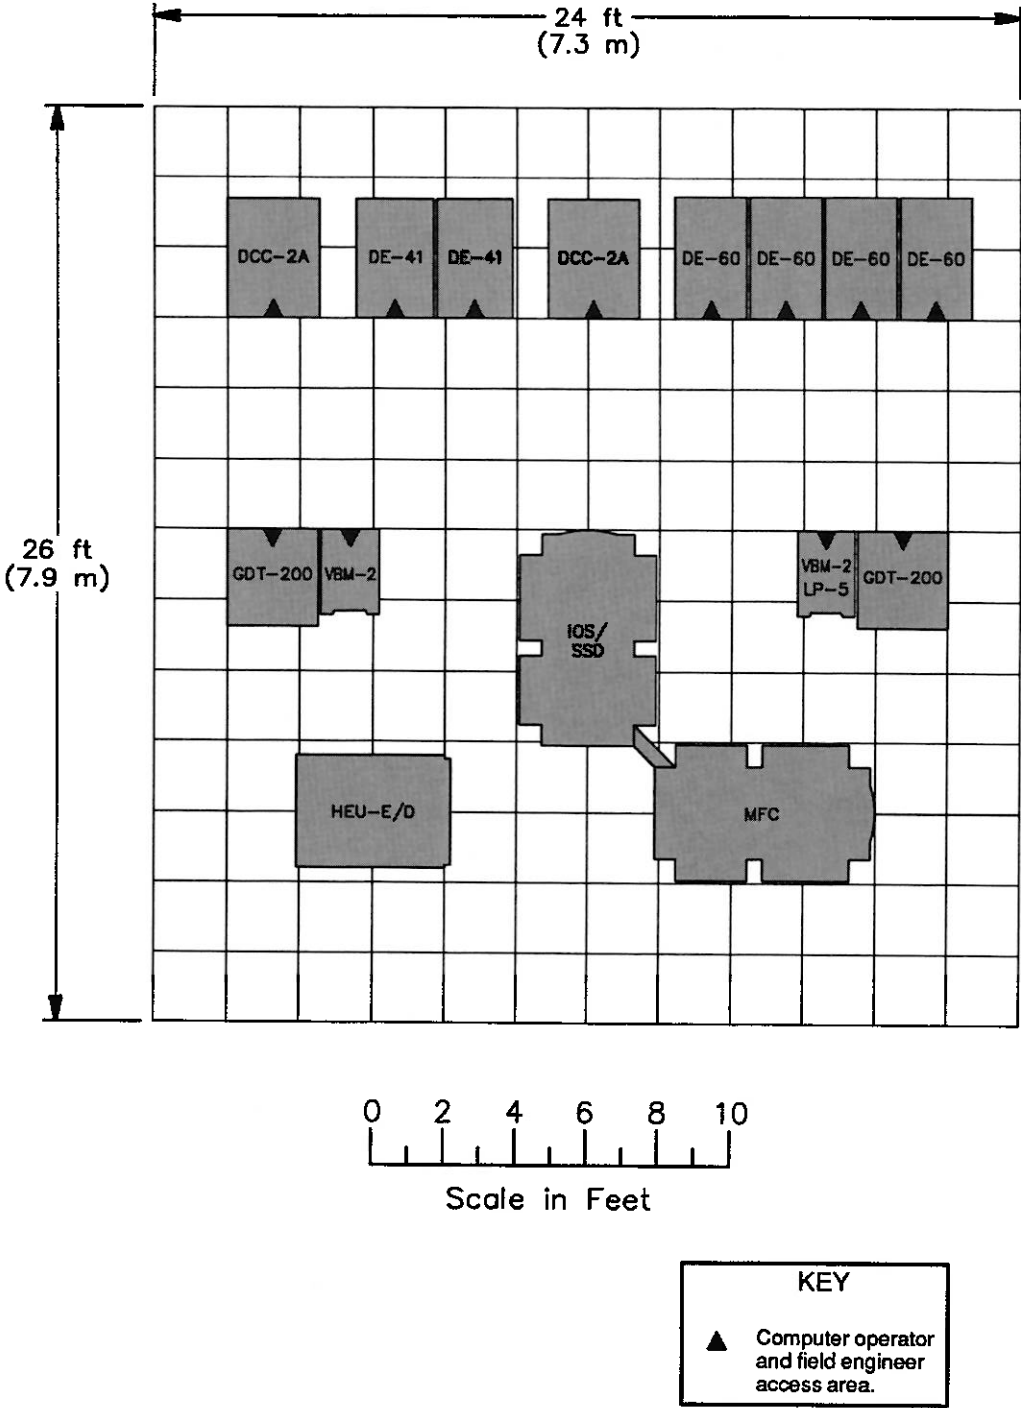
CRAY Y-MP8E Typical Floor Plan
